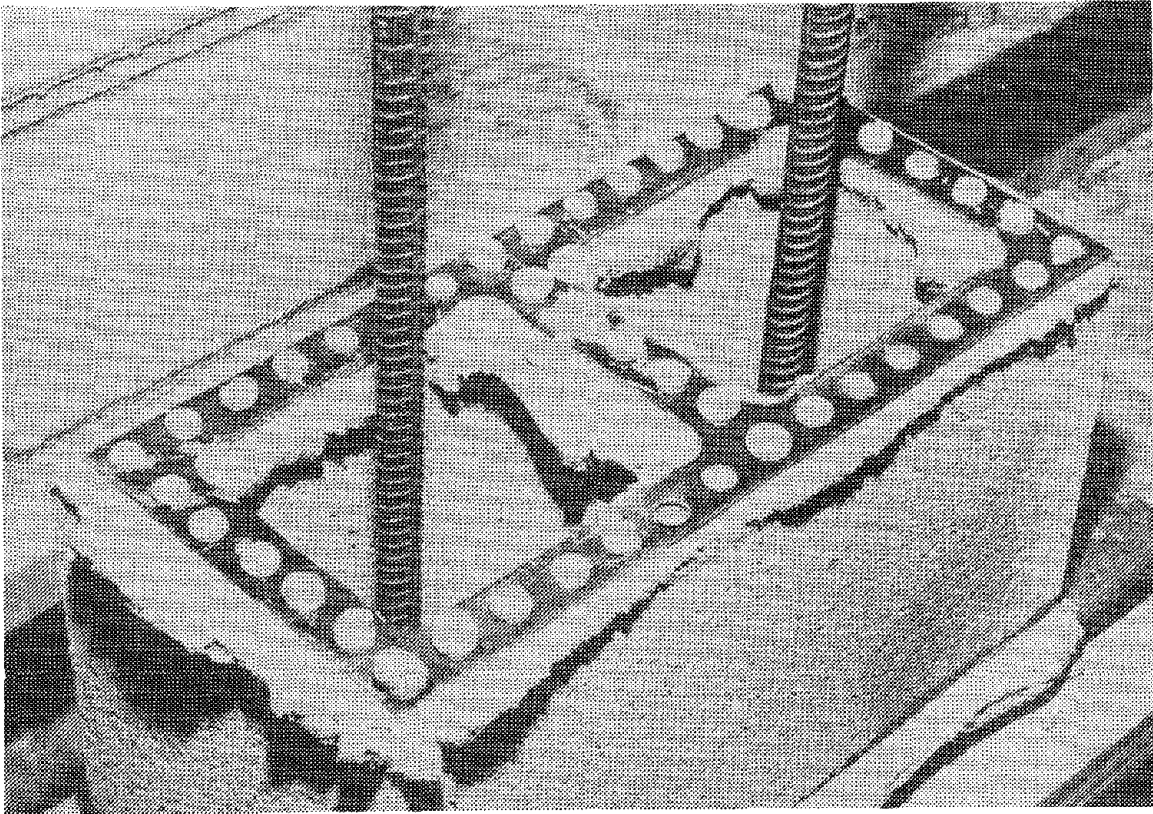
1/8" STEEL PLATE SET-UP
